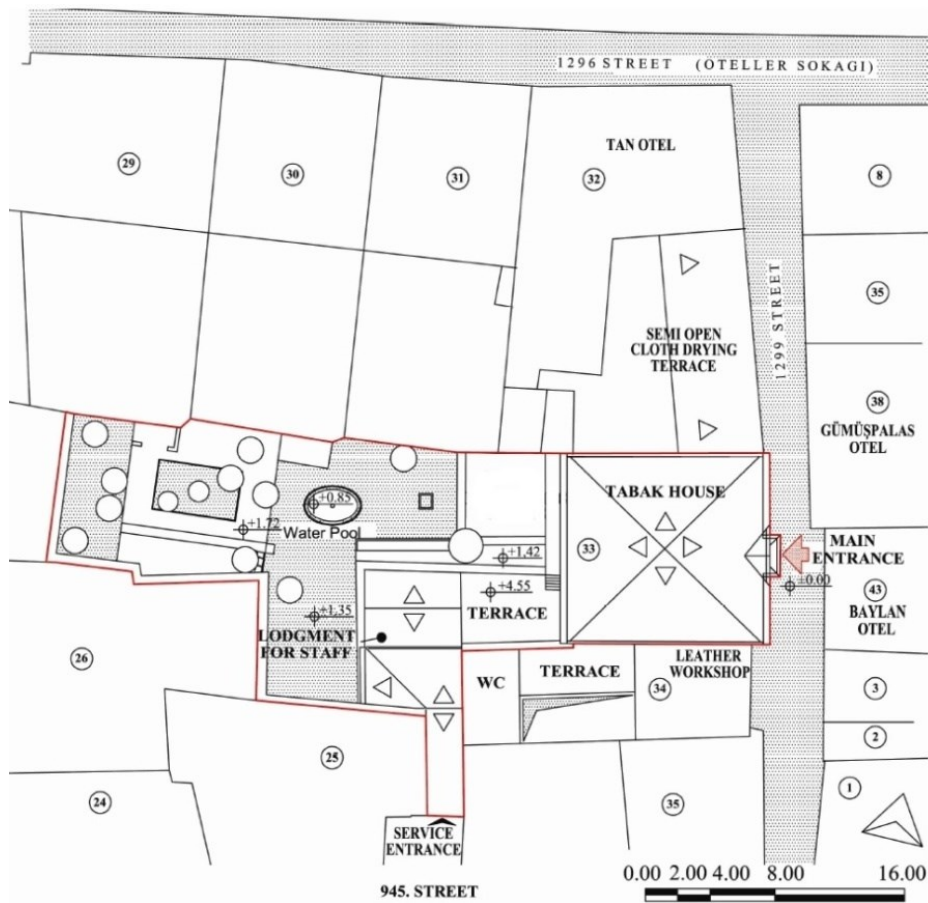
The site plan of *Basmane Semt Merkezi
